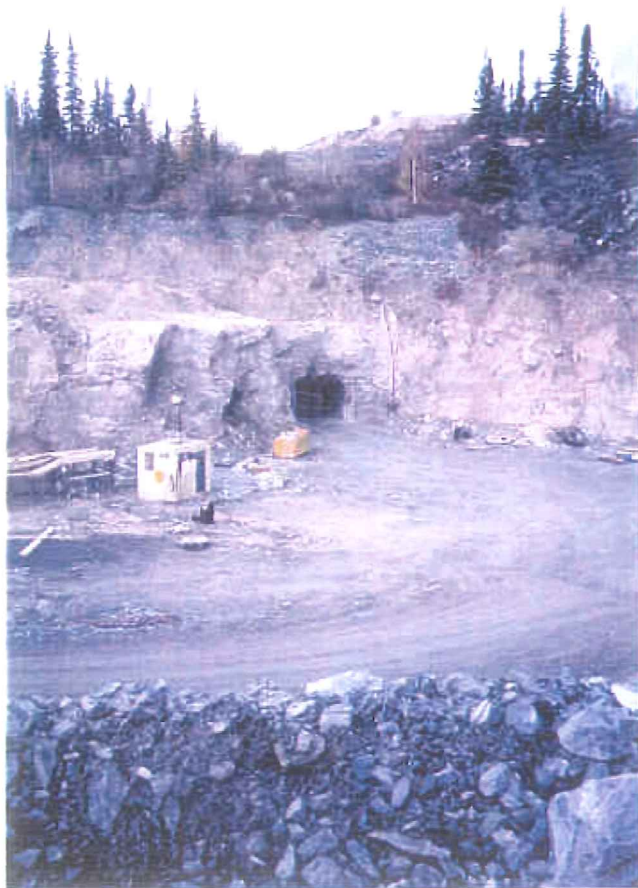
B4 Pit, looking north-west. Showing equipment portal and to the left, the small man-access portal, both connected to the same ramp.
